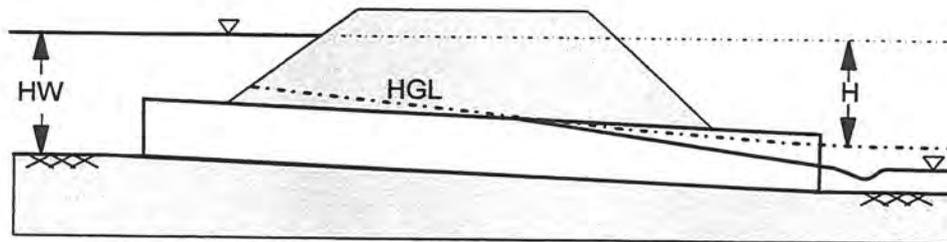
Flow Profiles for Culvert in Outlet Control
